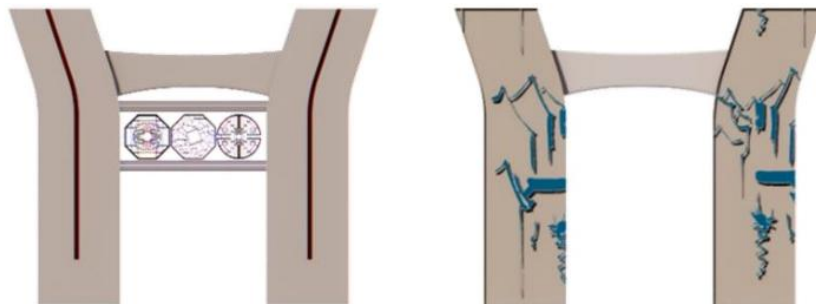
Regional element decoration on the bridge piers (Image source: Baidu)
